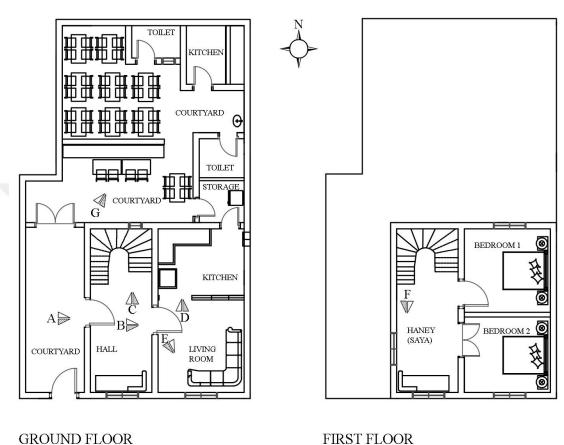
"İnci Hanım Pastry House" ground and first floor plans (S.Sevimbige archive, 2017)
